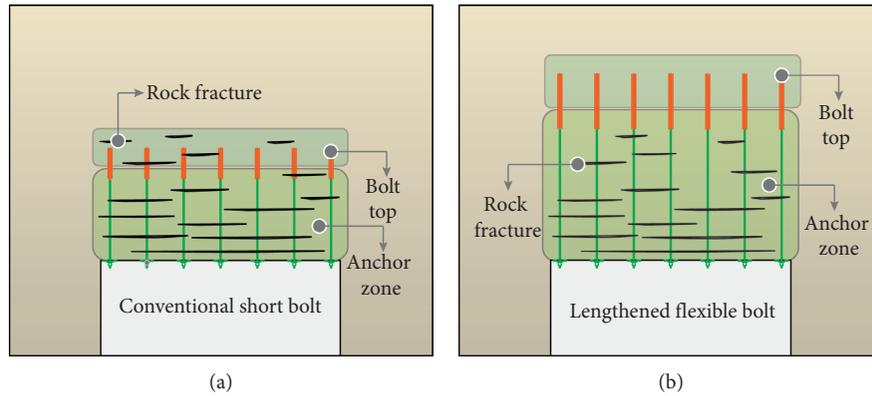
Stability characteristics of anchor structure: (a) conventional short bolt; (b) lengthened flexible bolt.
